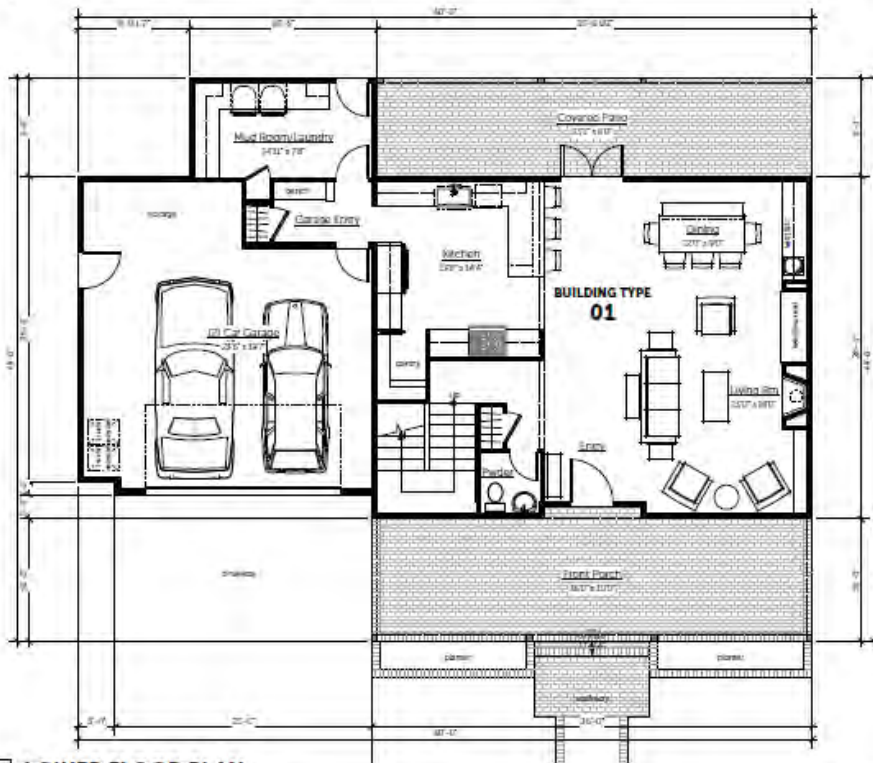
EXHIBIT D: ELEVATIONS / FLOOR PLAN
